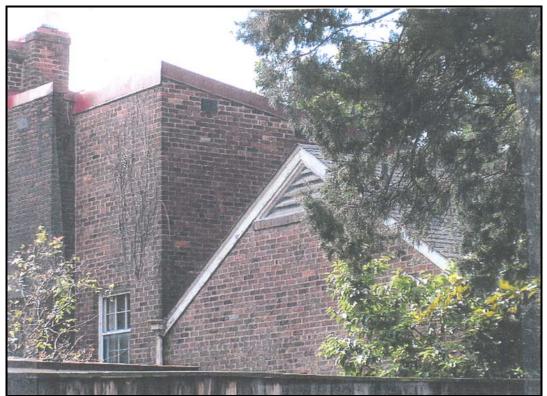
North Elevation Showing Area of Flounder to be Encapsulated
